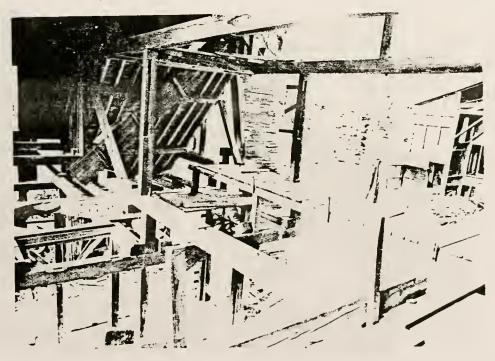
Arsenic plant (structure #59) interior view showing post and beam construction in the area at southwest corner of the plant.
